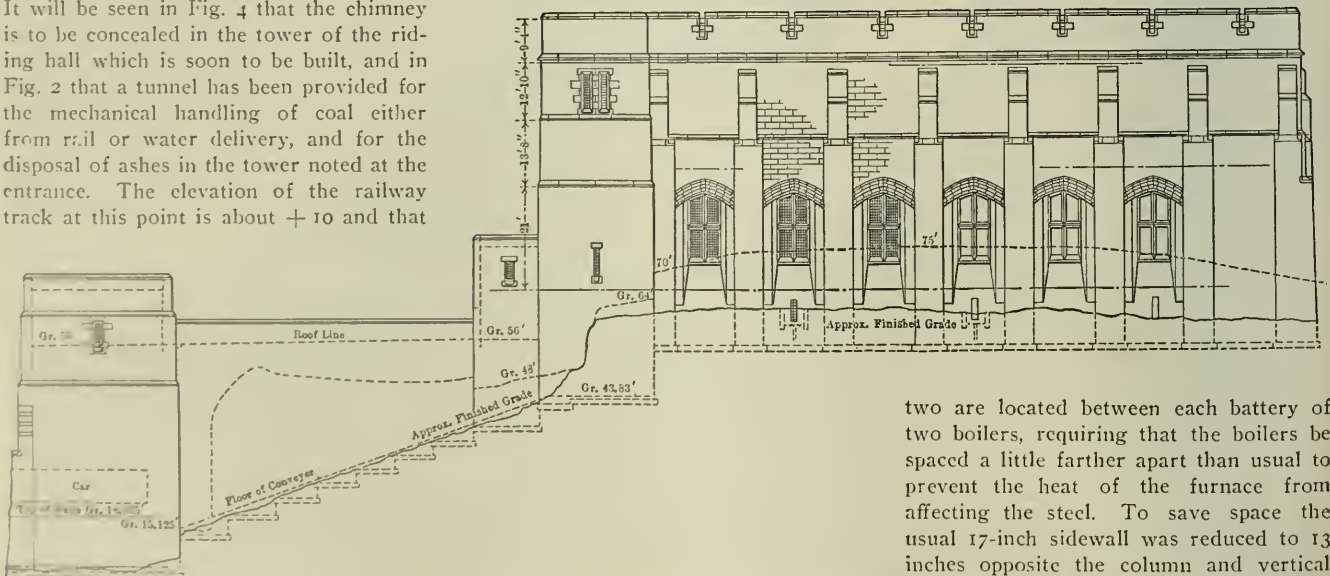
POWER PLANT ON RIVER SIDE, SHOWING ELEVATIONS OF COAL TUNNEL AND BUILDING
